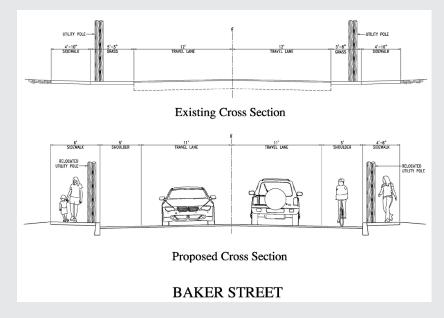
Complete Streets - sample sections showing improvements for Baker Street.
